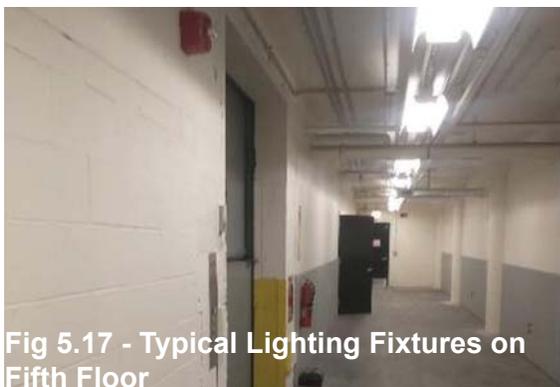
Typical Lighting Fixtures on Fifth Floor
